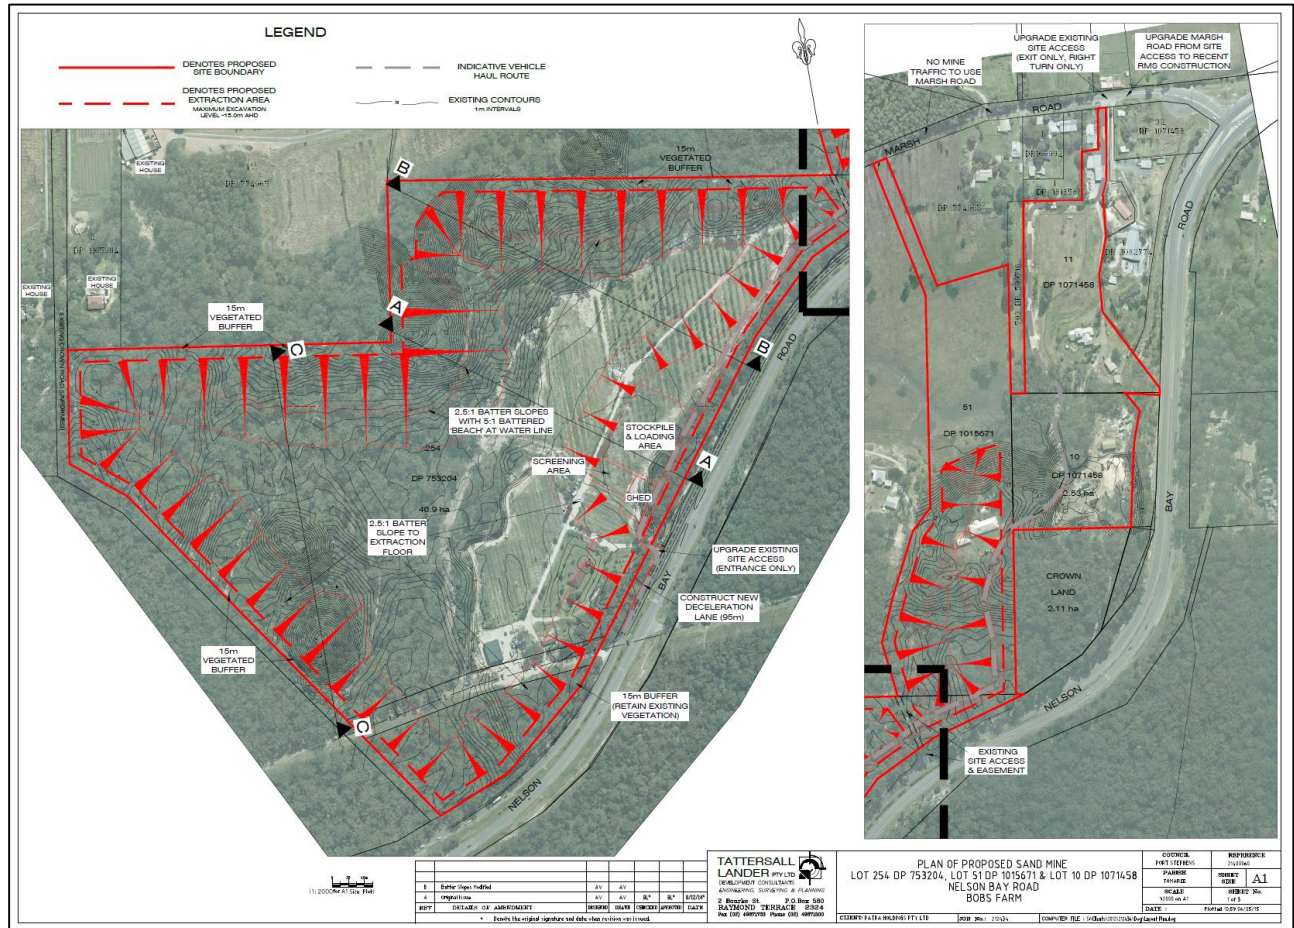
Overview of Extraction envelope for Bobs Farm Site
